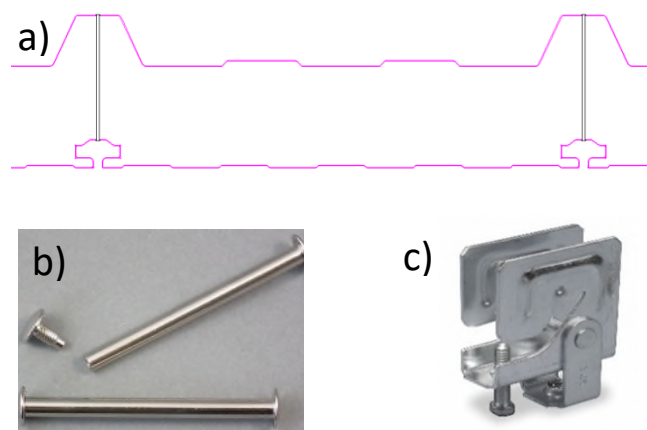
Schematic of panel for hanging mounting (a). Internal bolts (b), mounting bracket (c).
